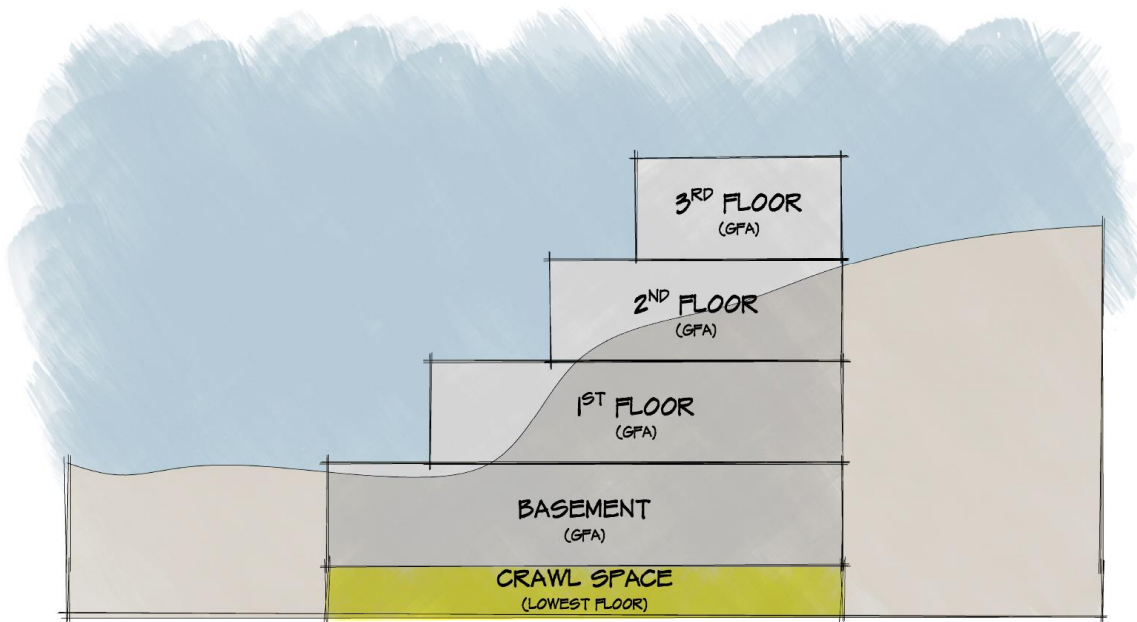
The Crawl Space is the lowest floor and would be excluded. The Basement is not the lowest floor and therefore does not meet the definition of in-ground basement floor area. It is therefore not eligible for exclusion and would be included in the gross floor area of the building.
